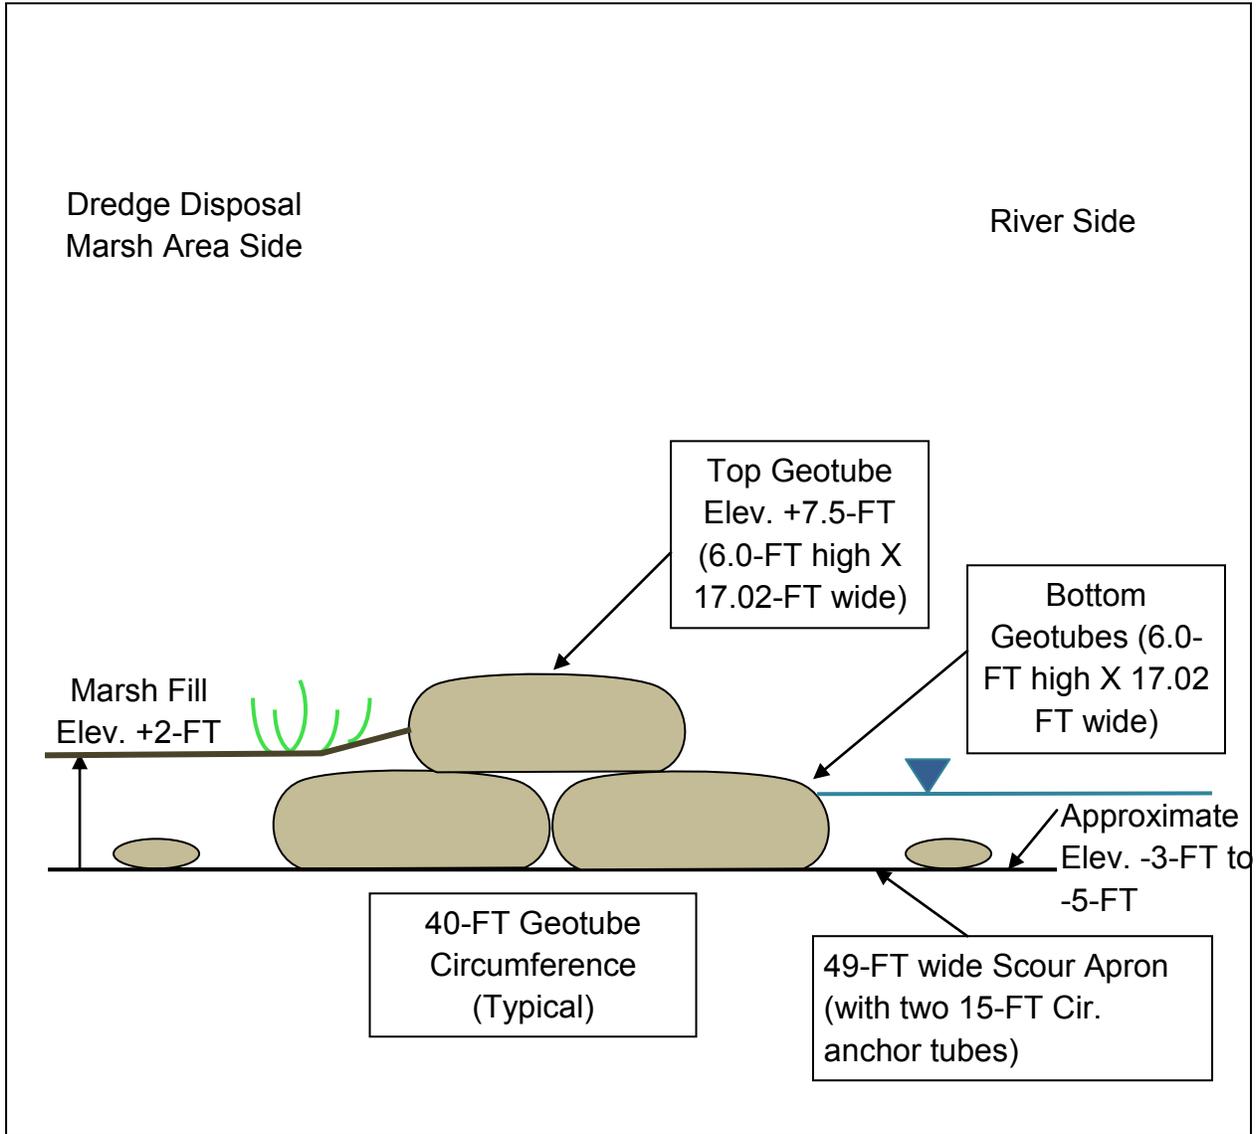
MILE POINT WEST TRAINING WALL WAVE ATTENUATION DEVICE SECTION (APPROXIMATELY 9.5-FT HIGH WAD STRUCTURE SECTION)
